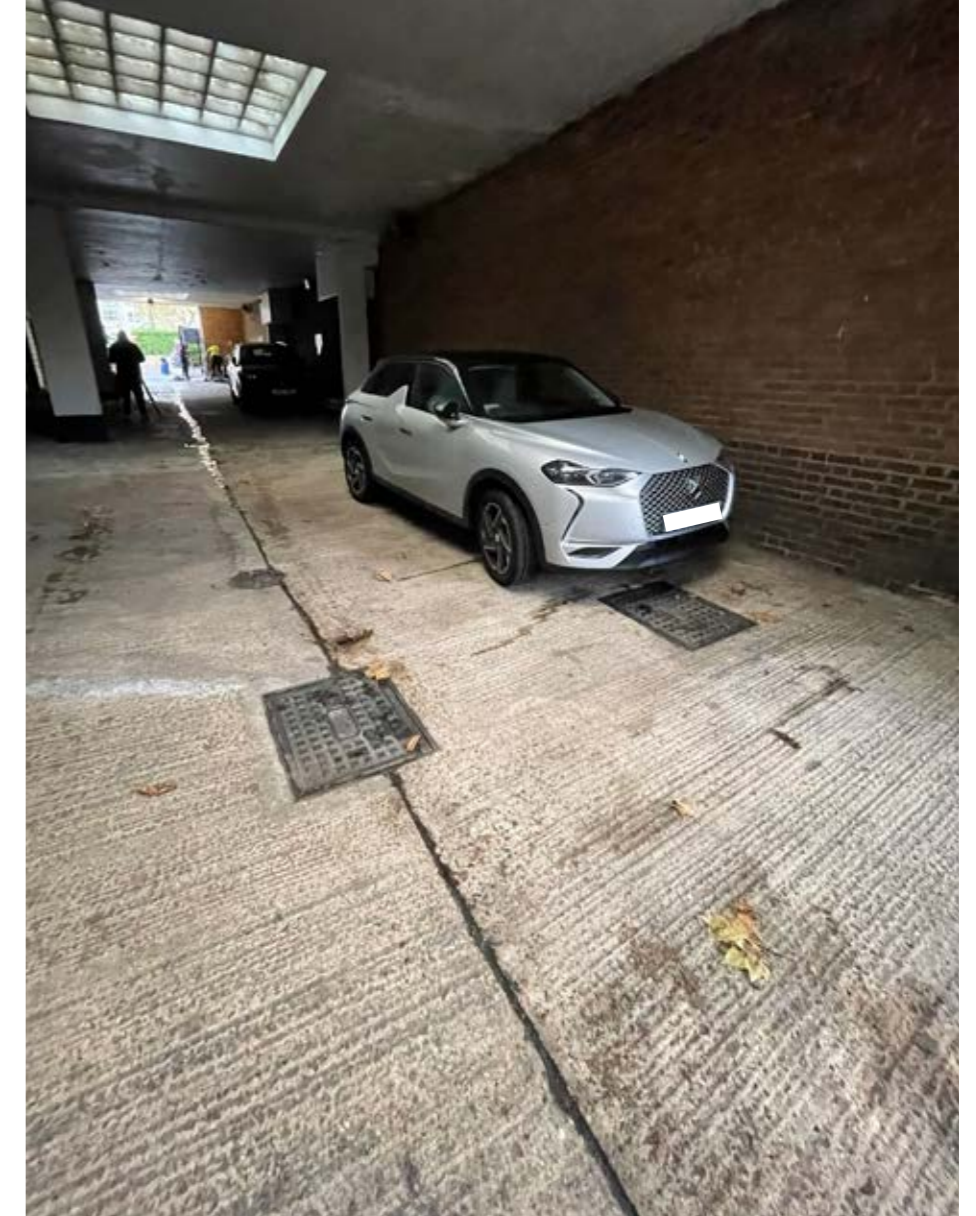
View from within the garage enclosure, looking towards the St John's Wood Park entrance in the distance.
